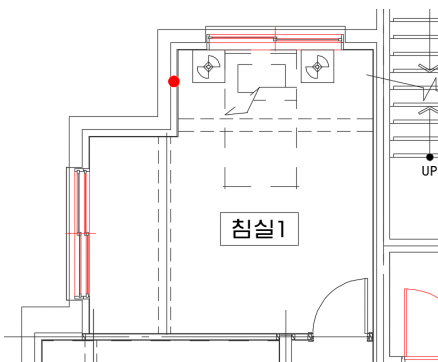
Outlet boxes are installed in the red spot of the exterior wall
